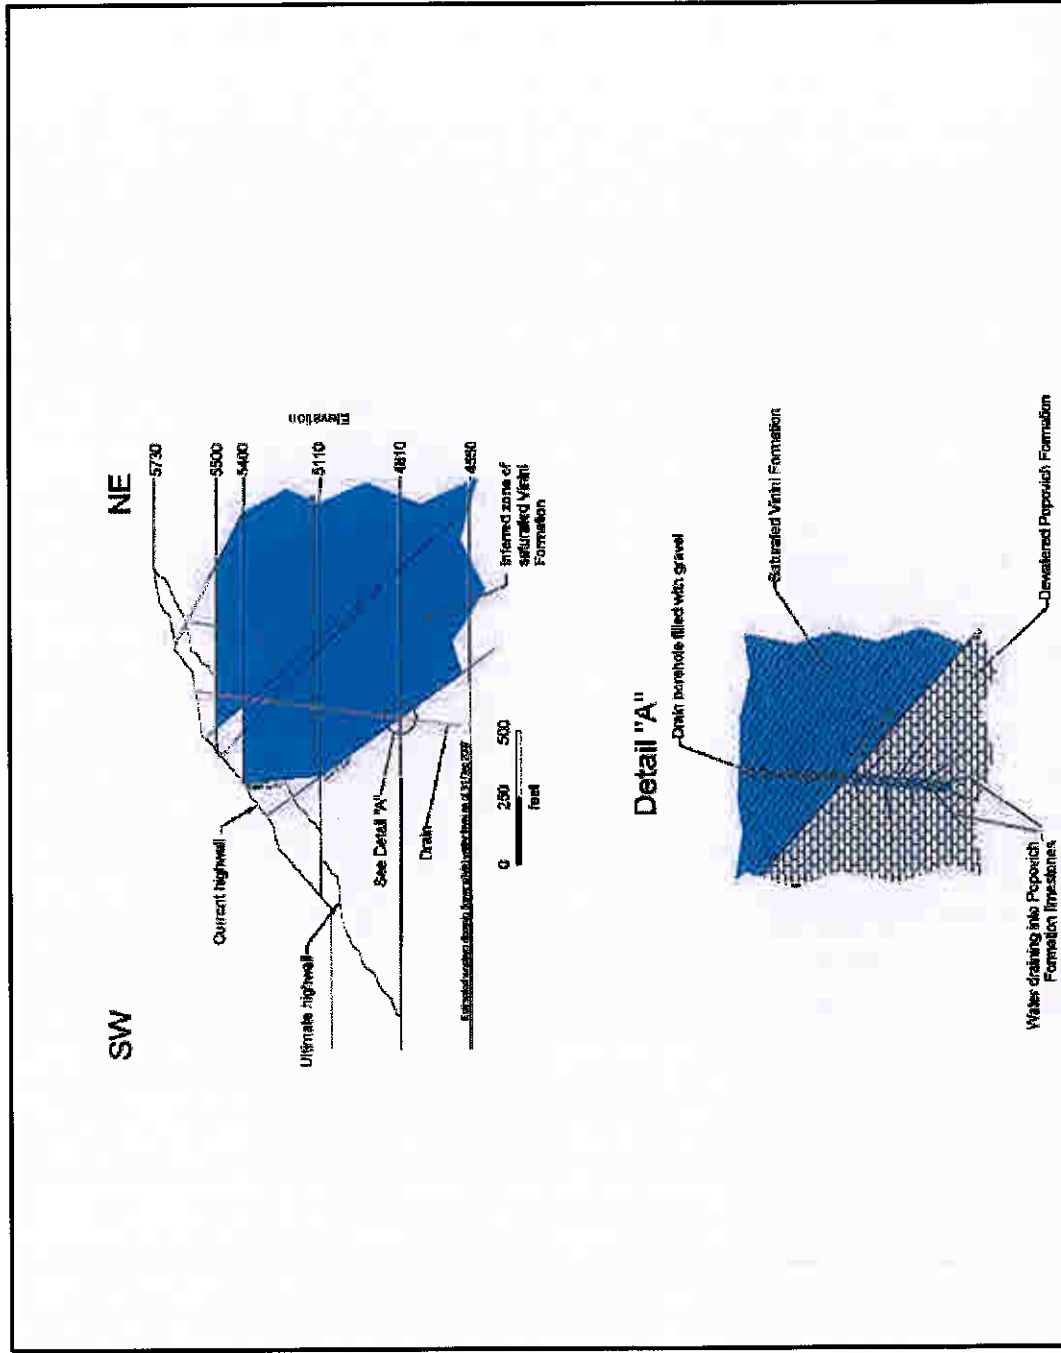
Genesis Cross-Section. This cross section through the northeast portion of the Genesis Pit, shows geologic structure, compartmentalized water, and a typical drain.
